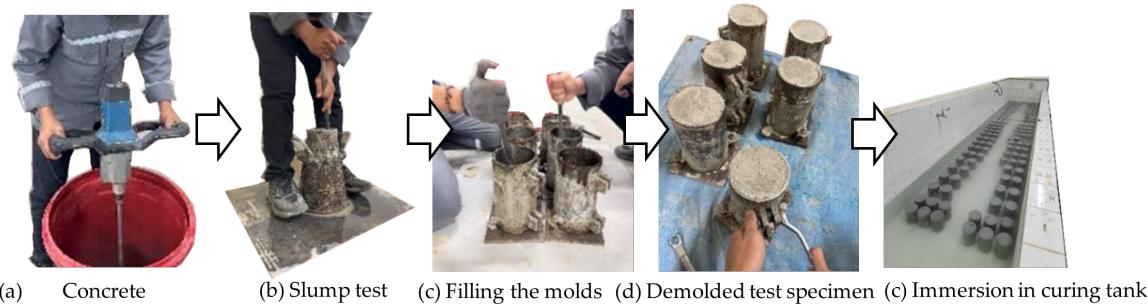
Preparation of concrete test specimens: (a) concrete mixing, (b) slump test, (c) filling the molds, (d) demolded test specimens, and (e) immersion in curing tank. Arrows indicate the sequence of specimen preparation
